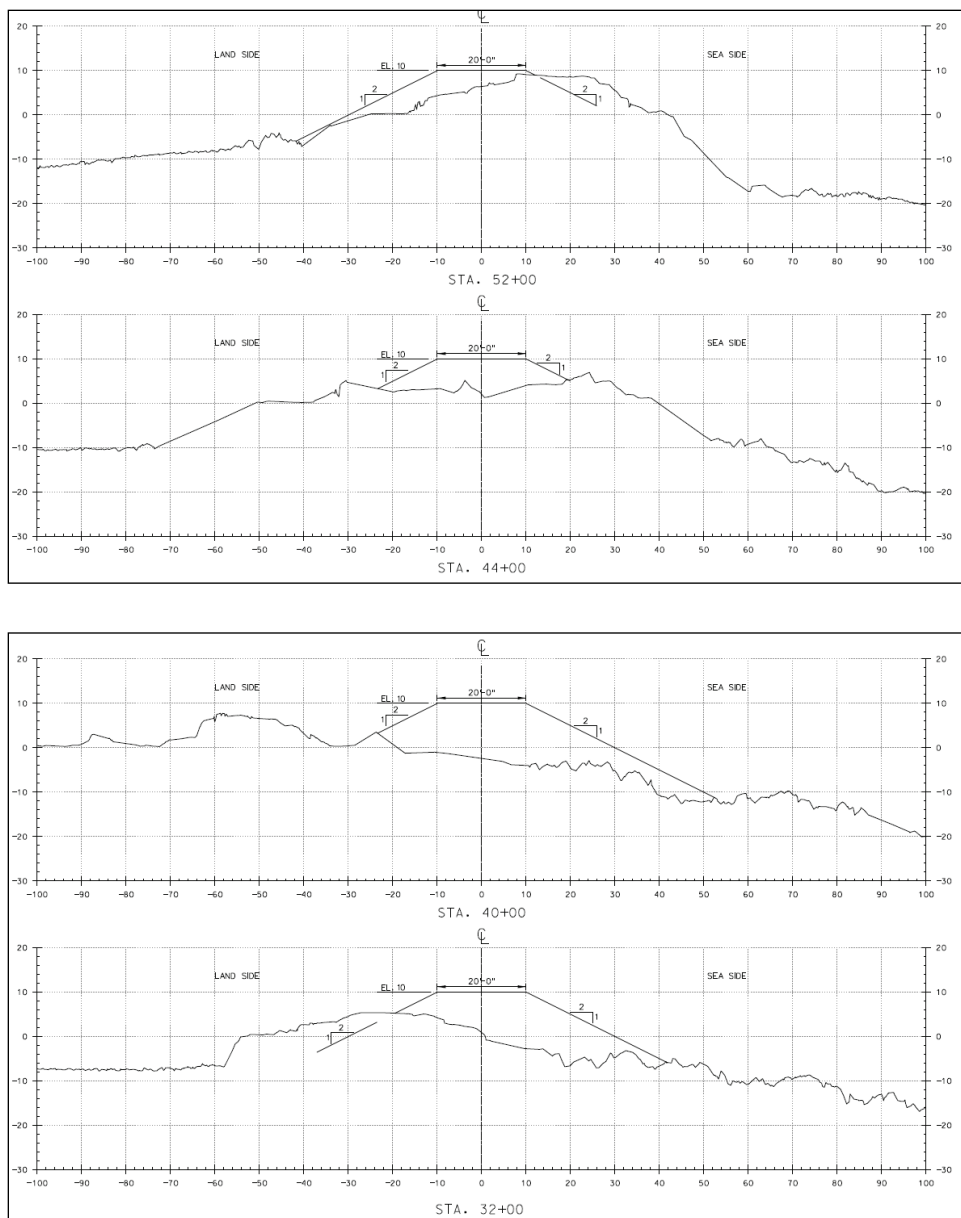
Alternative 2 idealized cross sections on existing damaged sections. Elevations are in feet relative to mllw, and stationing along the horizontal axis is in feet.
